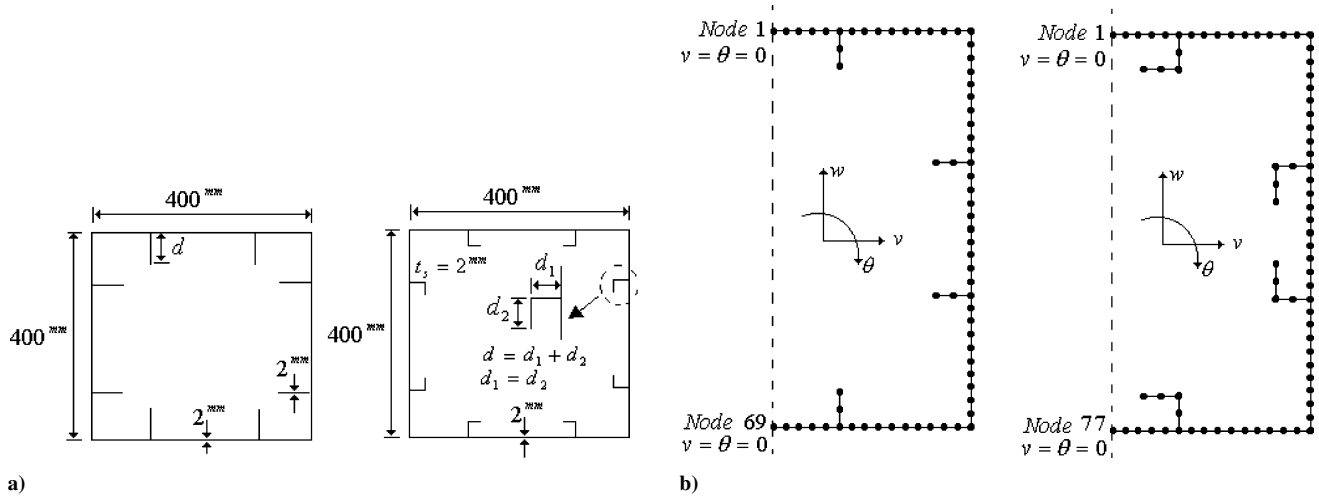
Dimensions and finite strip models of the stiffened box sections.
